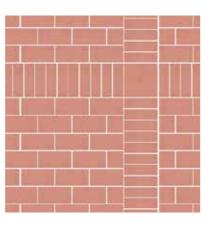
Square-shaped pavers at the intersections pf paving laid in a half bond
